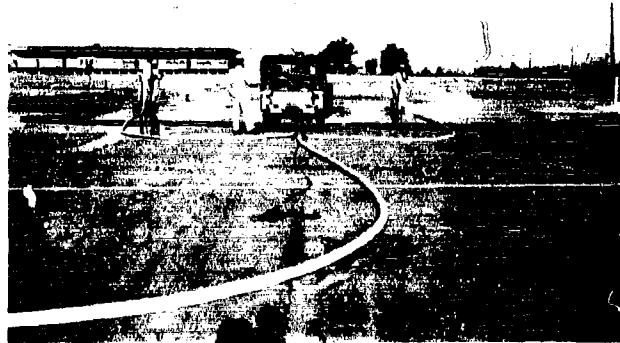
Firehosing on Portland Cement Concrete Pavement
